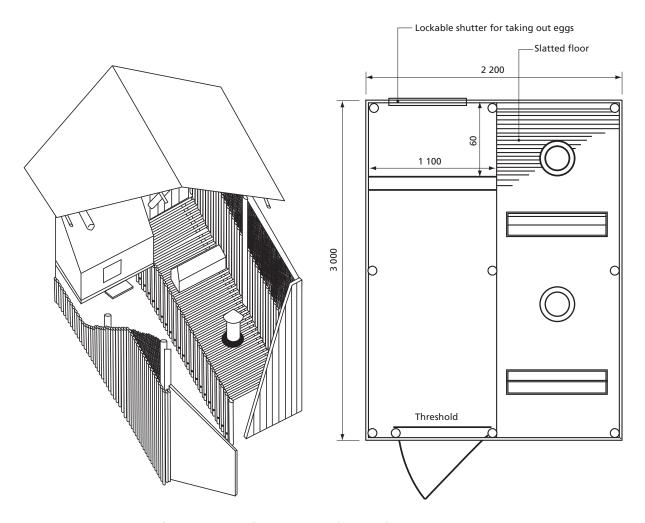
Poultry house for 40 layers, half deep-litter/half slatted-floor
